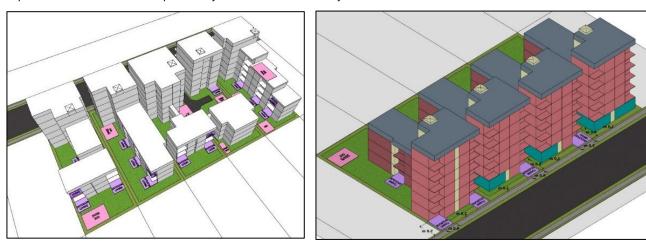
Models showing potential provision of ground floor outdoor living (purple) and communal space (pink) requirements for assumed adjoining future terrace and apartment development delivered in accordance with planned objectives for the THAB zone within walkable catchments.
